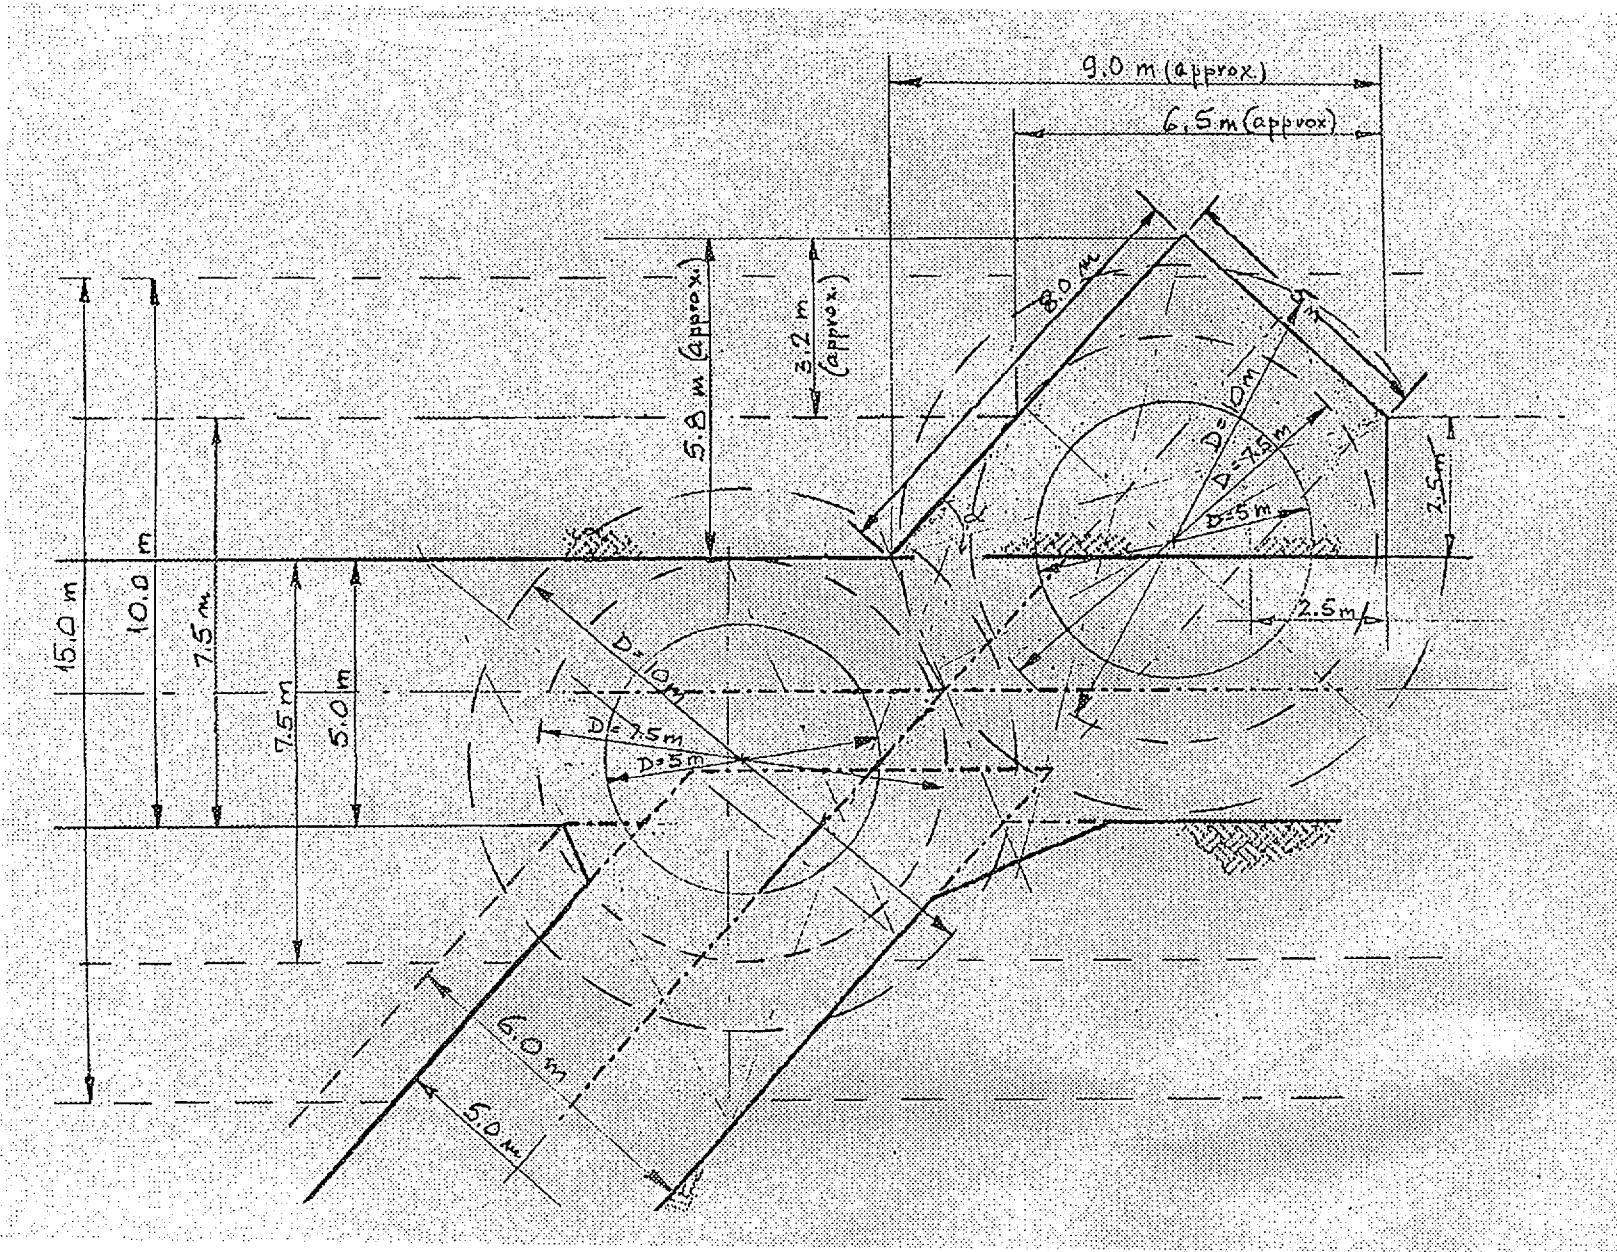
Typical ECRB Tunnel/Test Alcove Intersection with an Overlay of Roof Span Zones Equal to 5.0, 7.5 and 10 meters .
